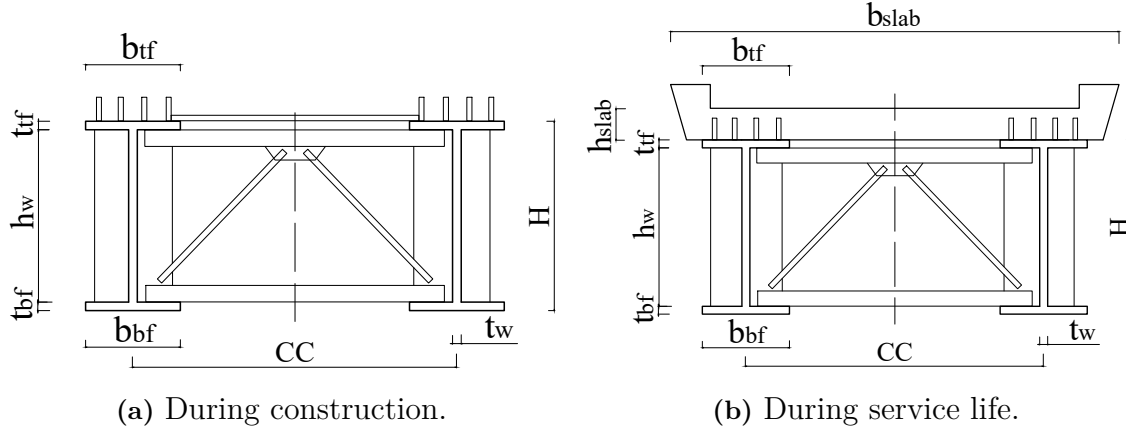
Geometry of the I-girder bridge's cross-section.
